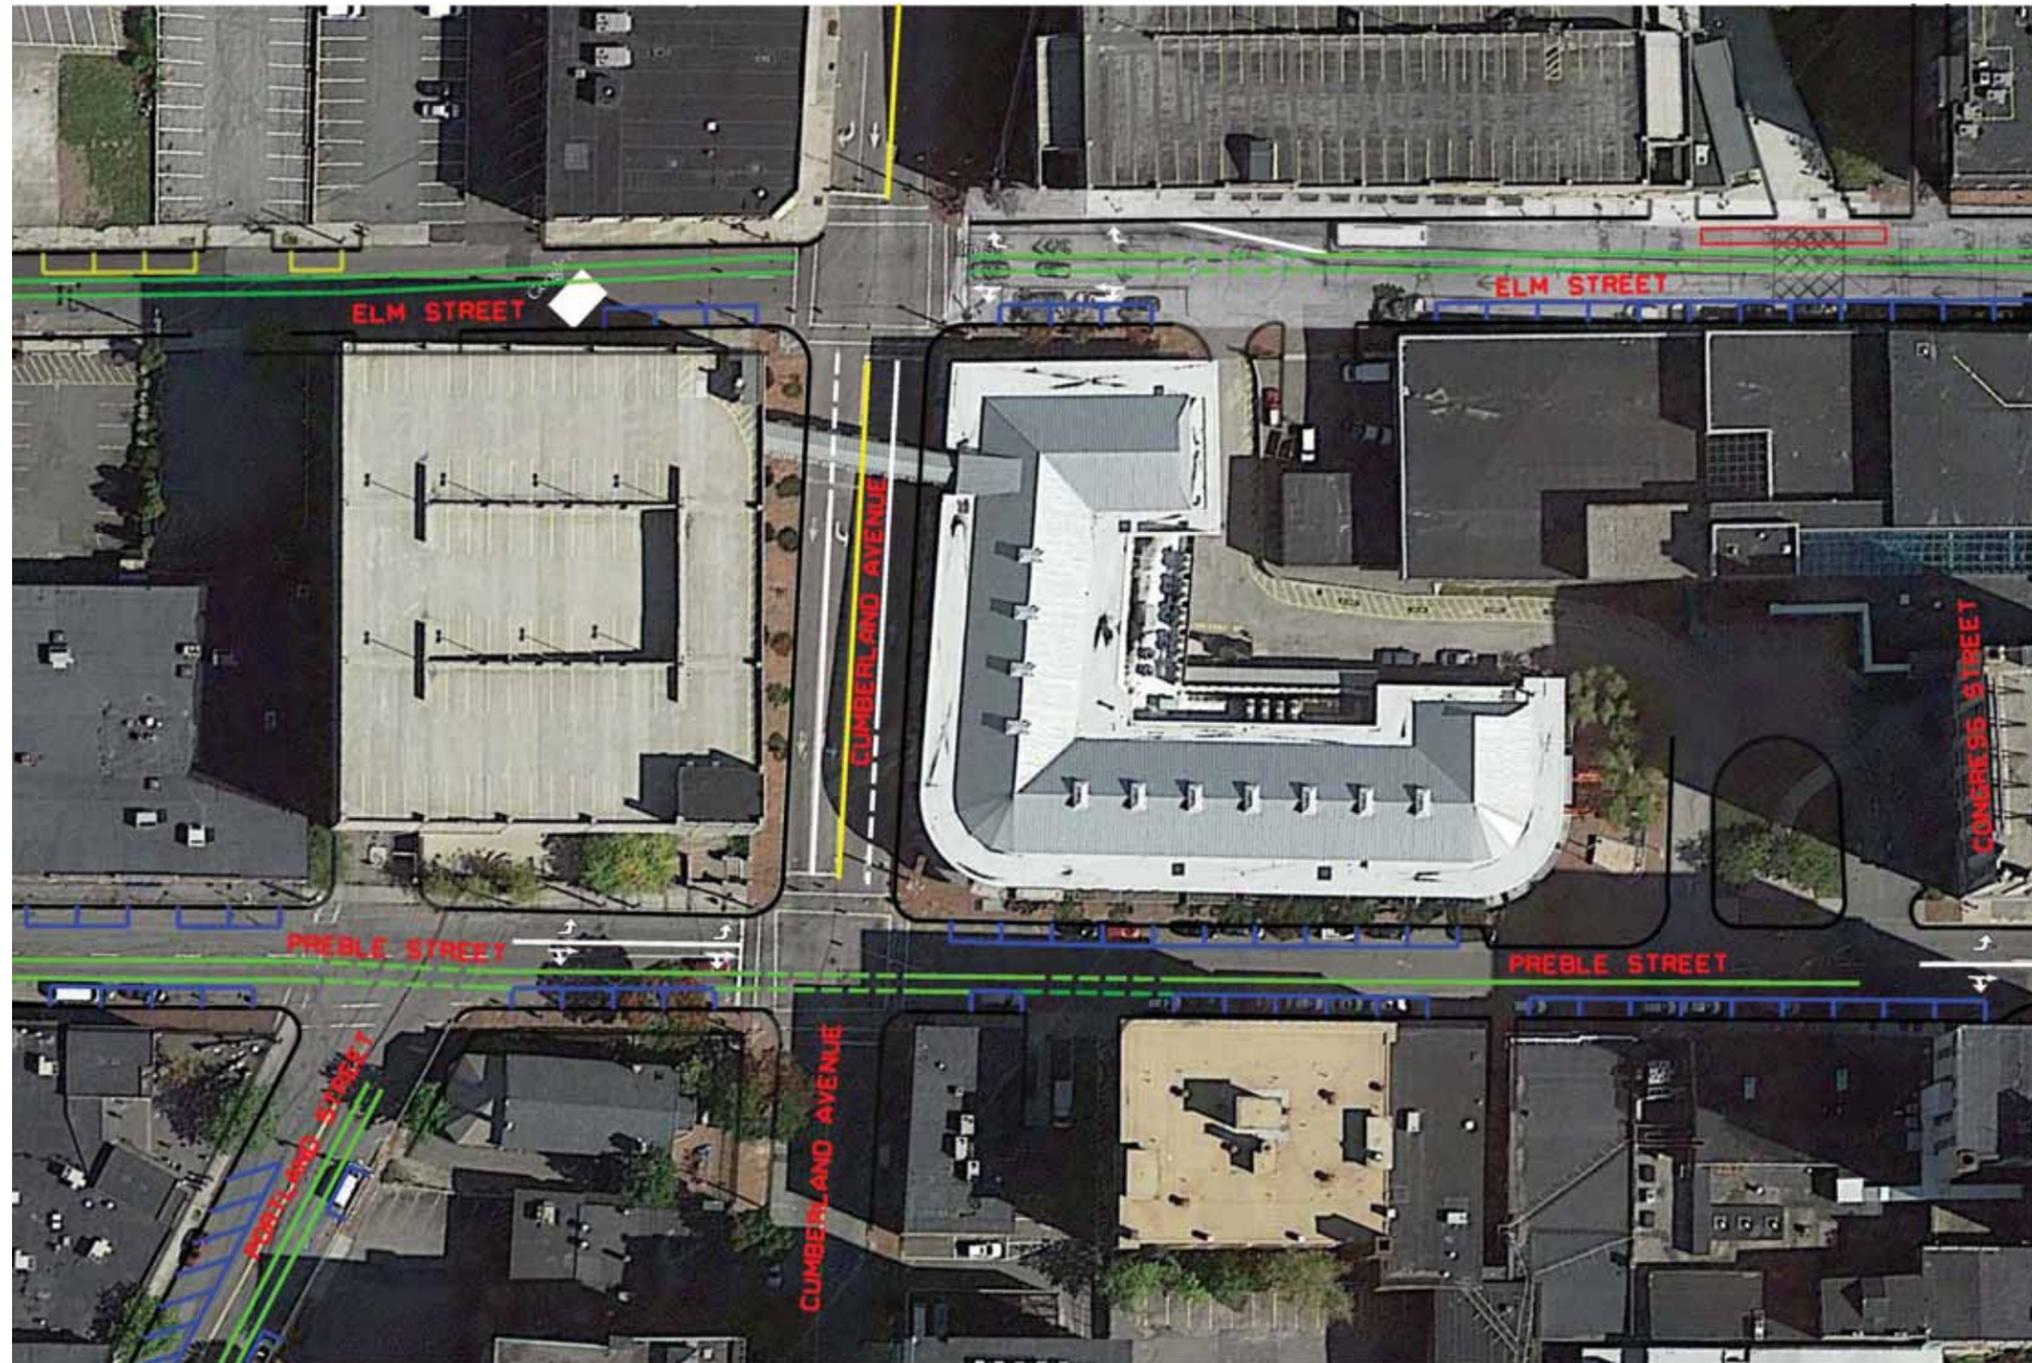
Section 1 of 3 – Preble and Elm Street - Long Term
